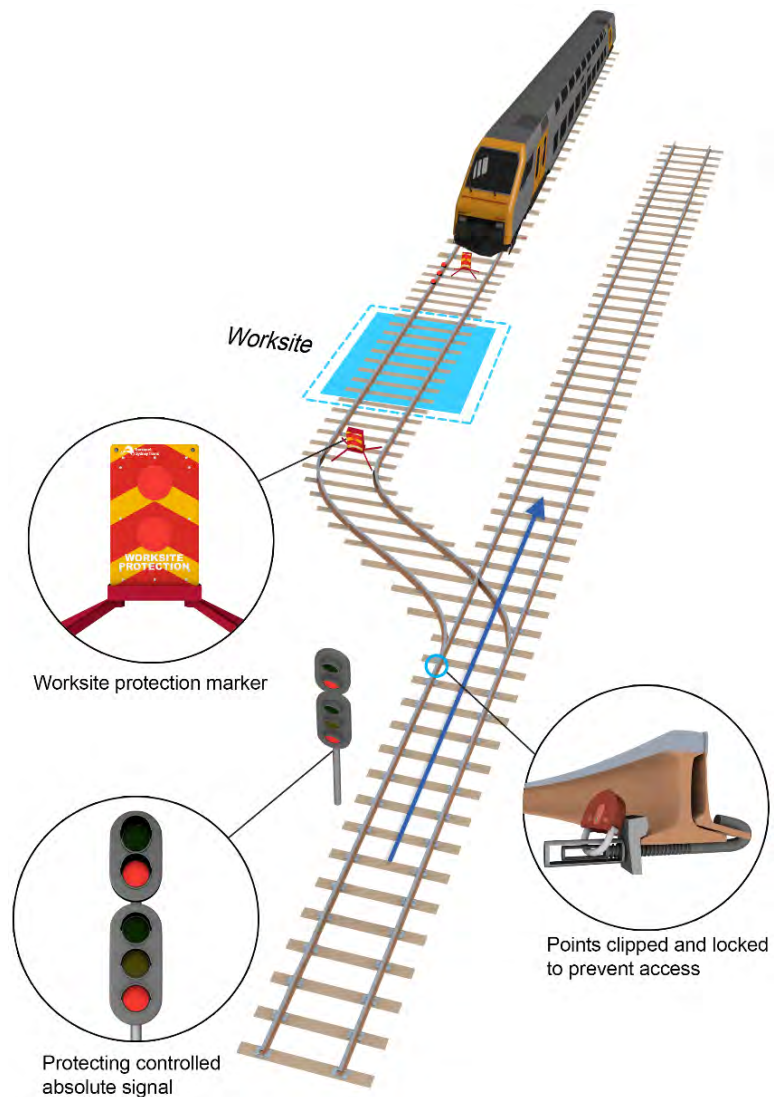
Example of protection arrangements for a worksite within a siding occupied by stabled rail traffic not associated with the TOA
